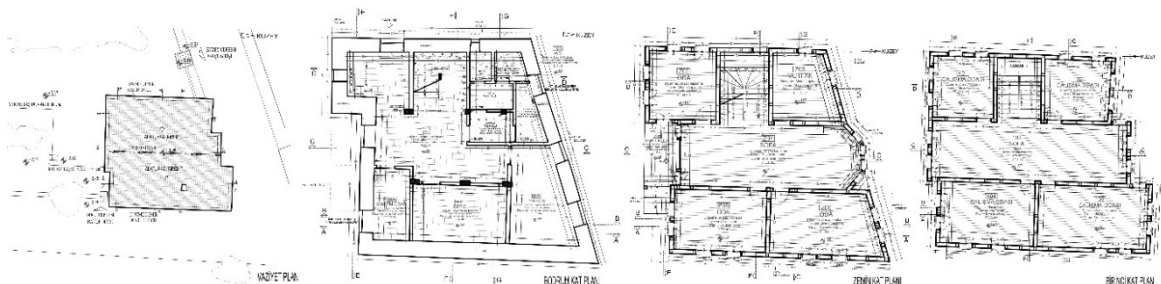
Floor plans of the mansion (Source: ORAN Development Agency, Photo archive)
